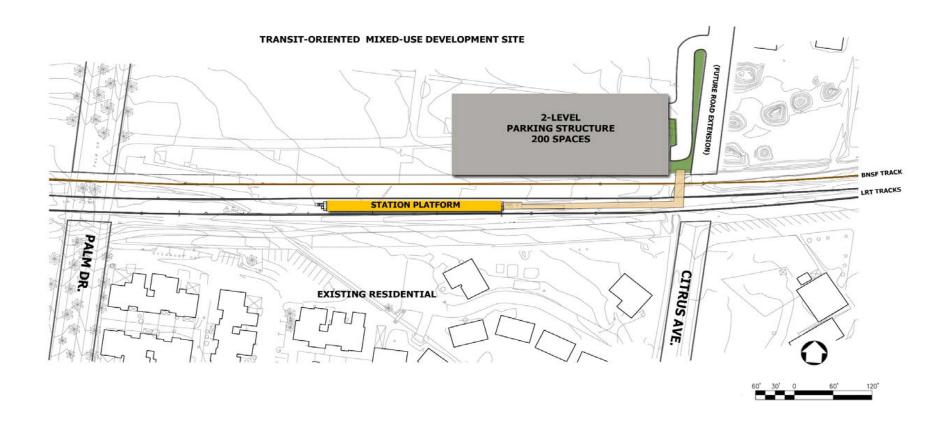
Site Plan: City of Azusa, Citrus Avenue Station
